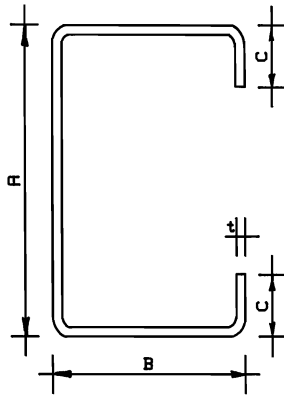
DIMENSIONS OF CHANNEL SECTION
